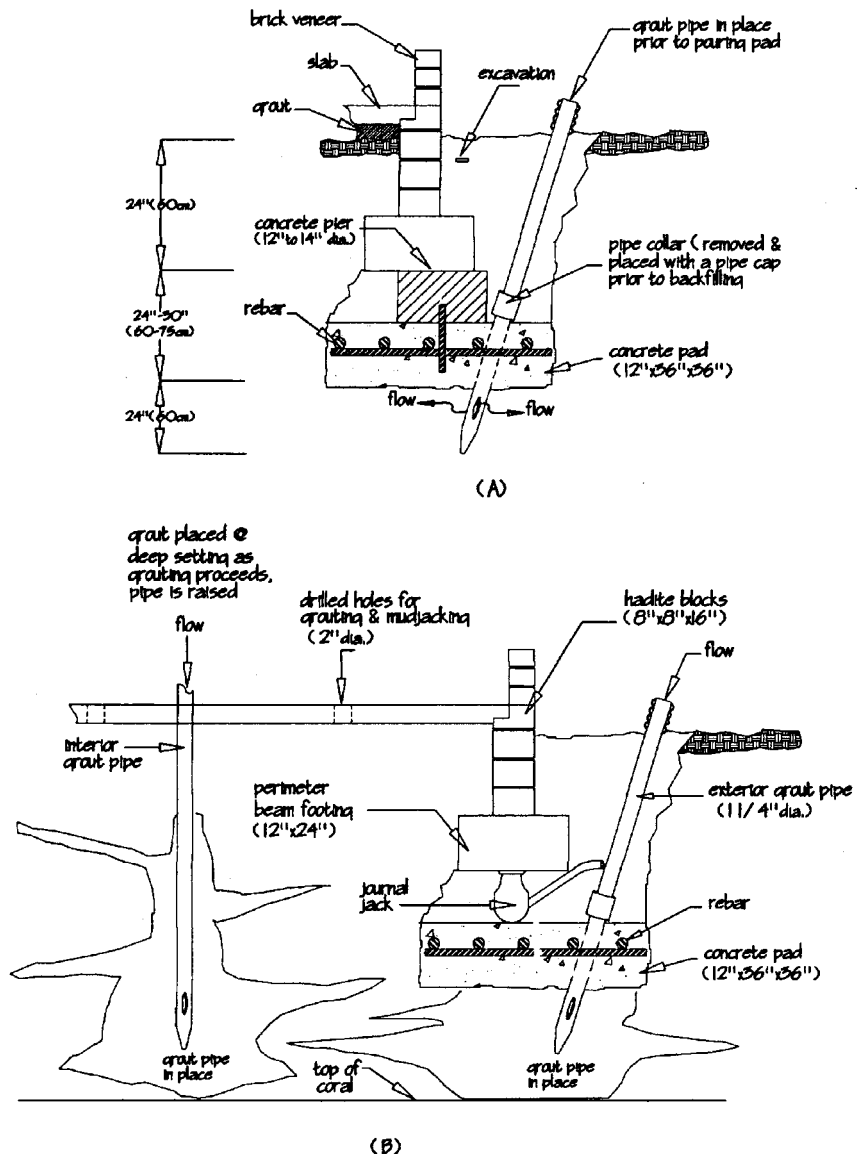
B.7.1. Florida repair. (a) Grout pipe in place; (b) typical deep grouting procedure.
